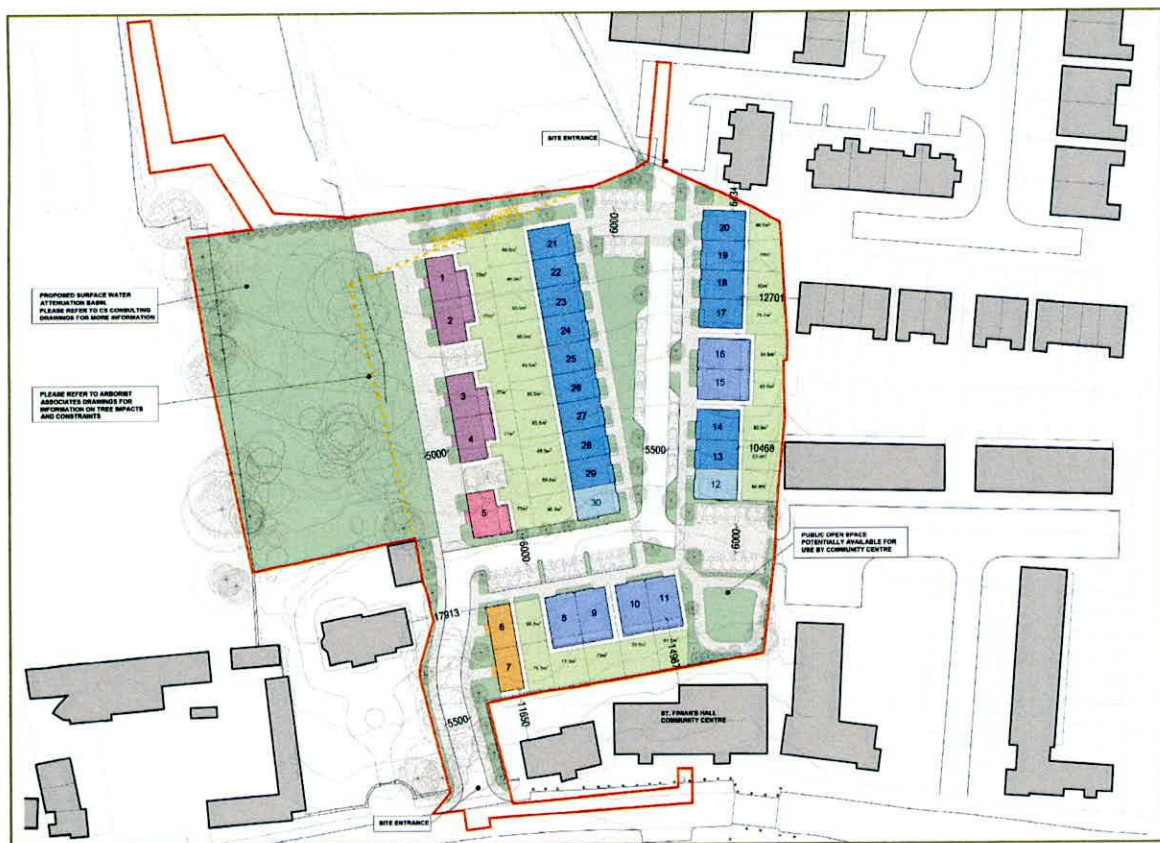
Plan of Proposed Development, Newcastle North, Newcastle, County Dublin
